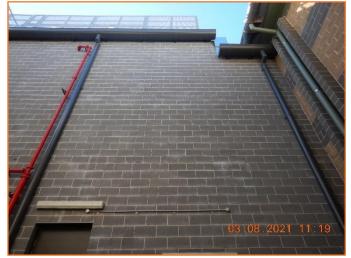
Reasonable - General condition of external masonry wall. Minor efflorescence observed.
